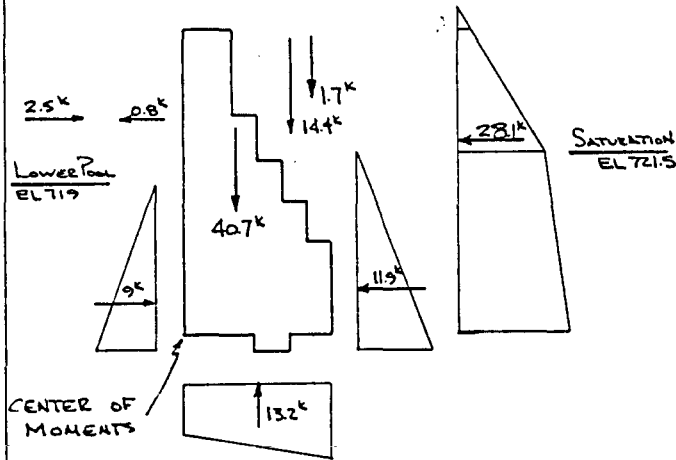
LAND WALL - LOWER GUIDE WALL L-55
